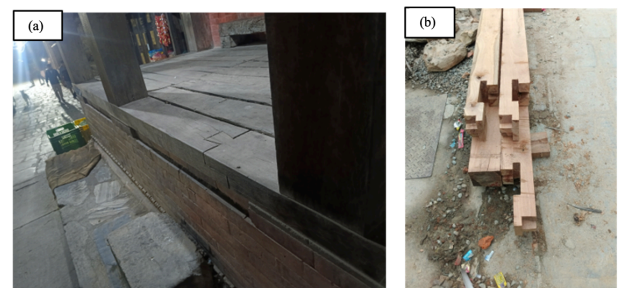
Timber joint (a) Dove-tail joint in plinth tie beam (b) Scarf joint preparation for floor beam
